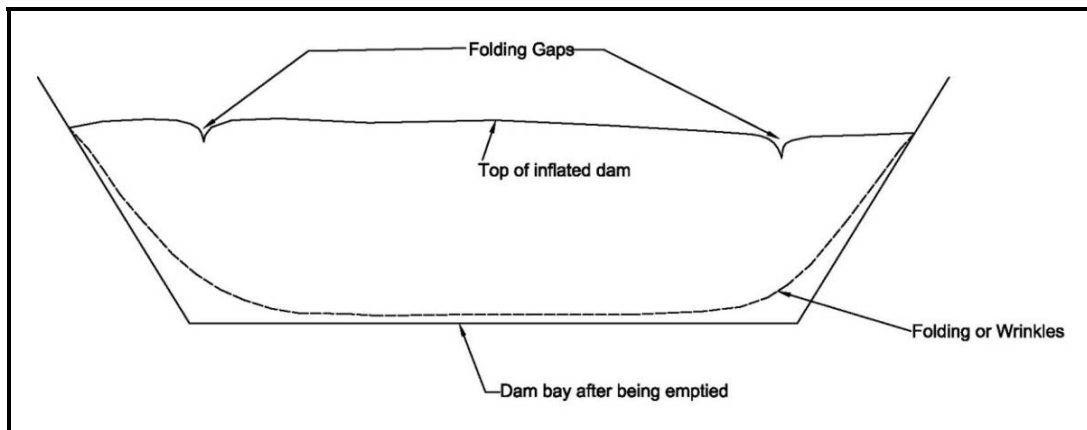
Folding gaps or Wrinkles of Conventional Rubber Dam
